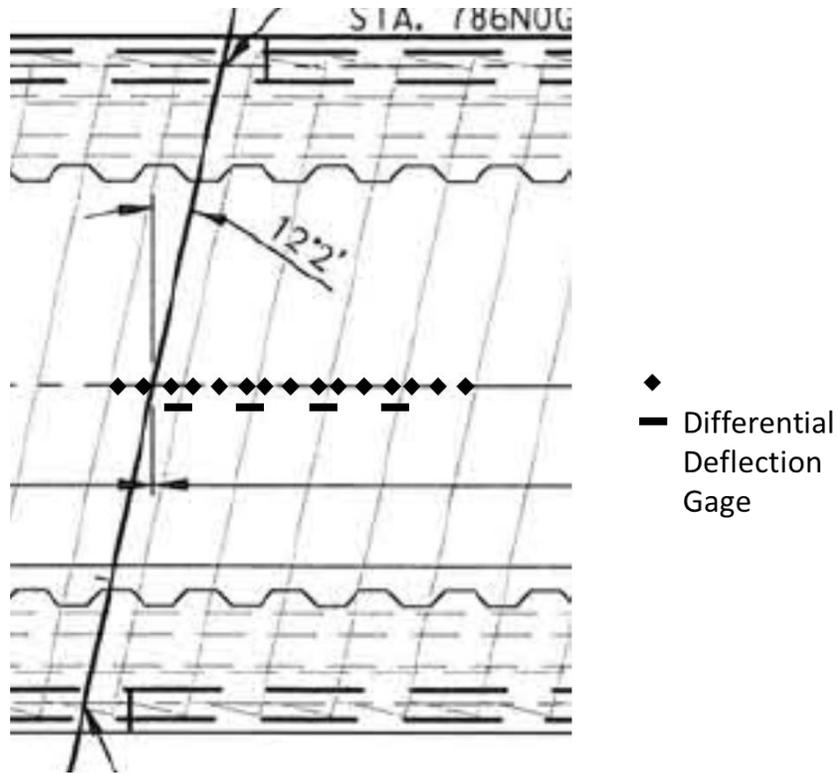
US 41 over Ashwaubenon Creek instrumentation locations - plan view
